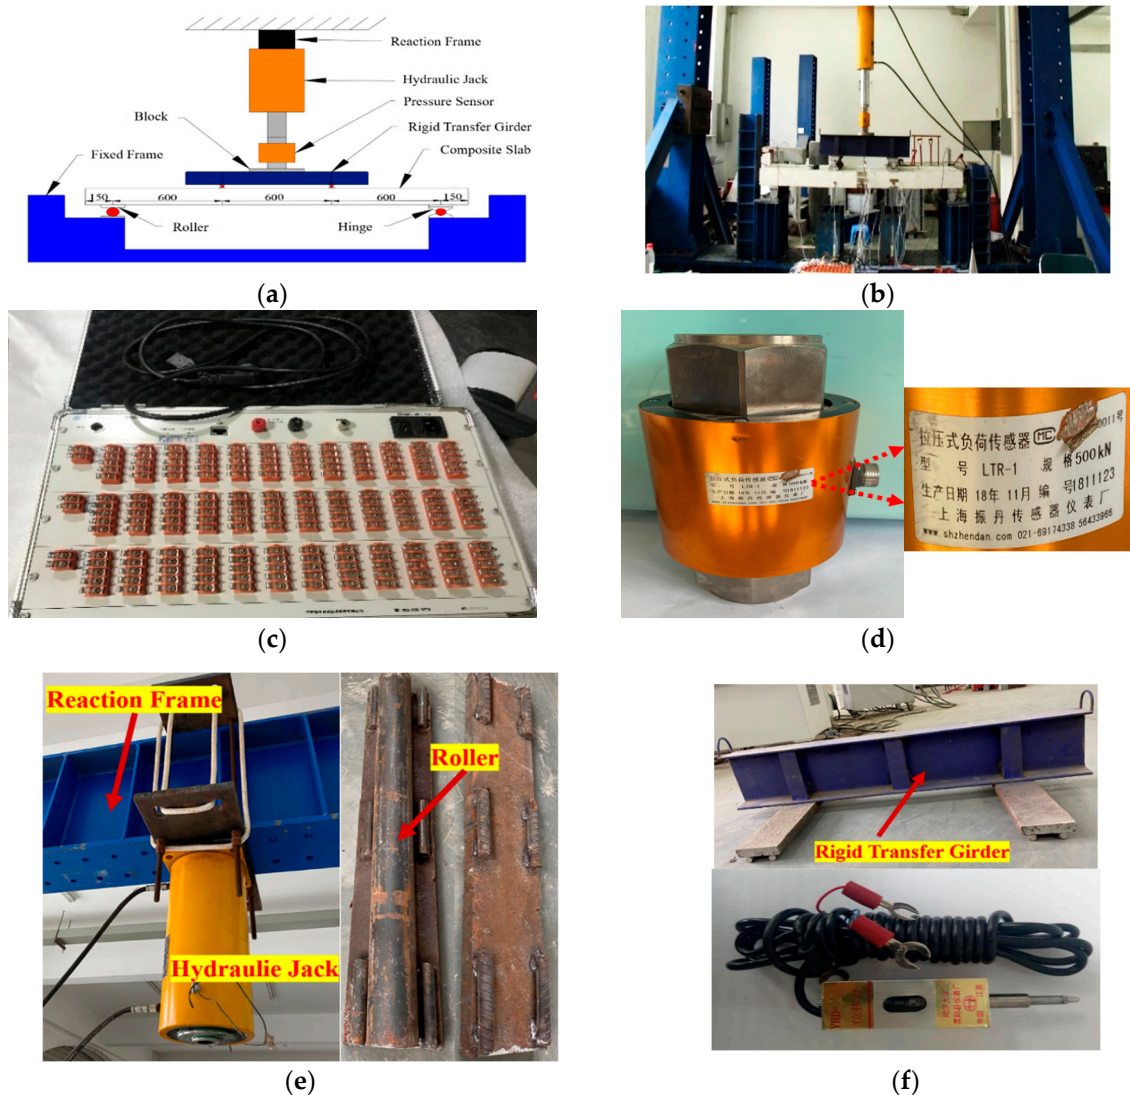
The loading devices. (a) Test setup layout; (b) picture of the test equipment; (c) the ATS380 test system; (d) pressure sensor (500 kN); (e) hydraulic jack and rolling supports; (f) rigid transfer girder and displacement meter (unit: mm).
